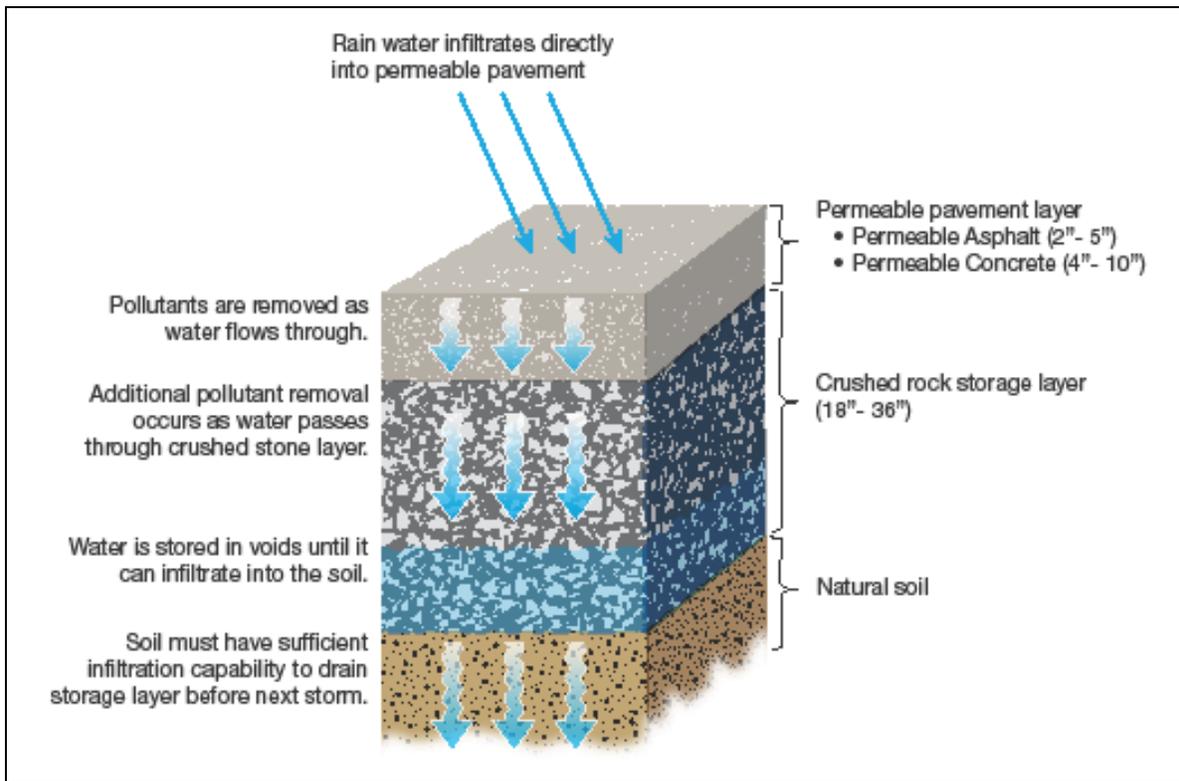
Cutout of a permeable pavement system. Note that pavement thicknesses are for low-volume applications.
